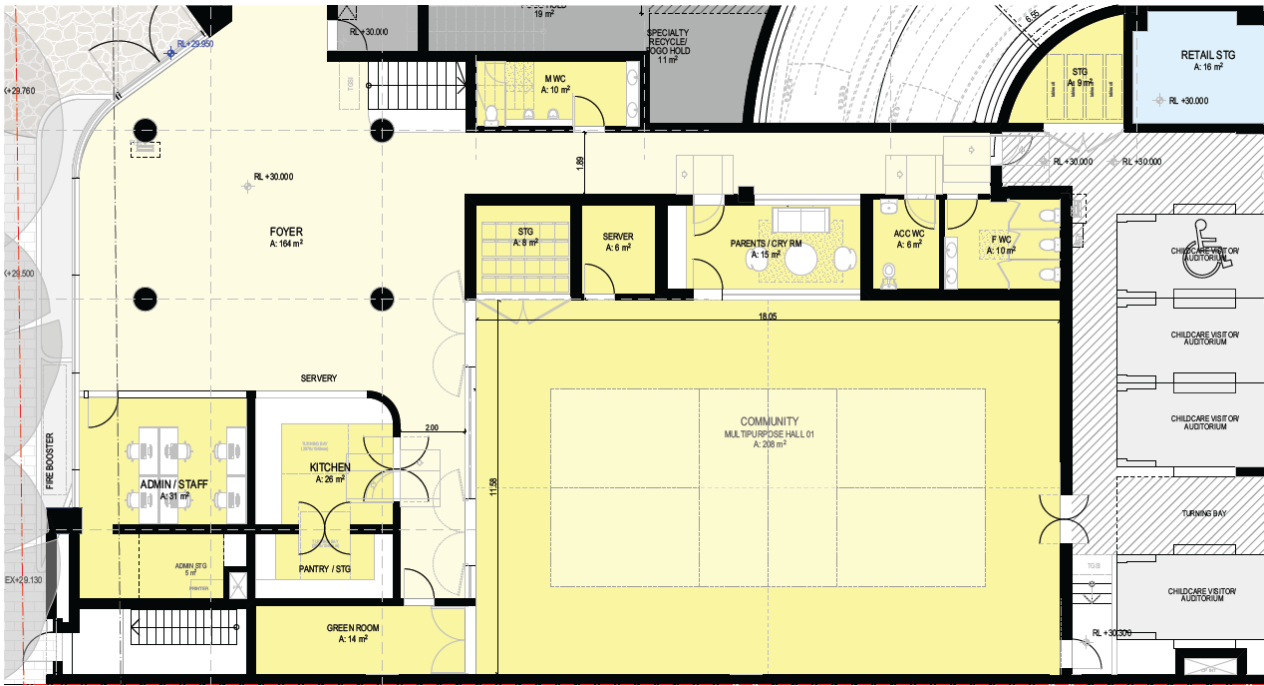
Floor plan of ground floor community facility adapted for pickleball
